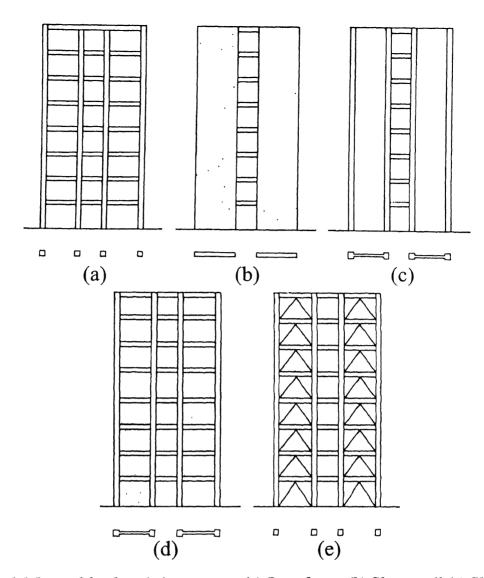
Lateral-load-resisting systems (a) Pure frame (b) Shear wall (c) Shear wall with columns (d) Infilled shear wall (e) Braced frame (from Wakabayashi, M., 1986).
